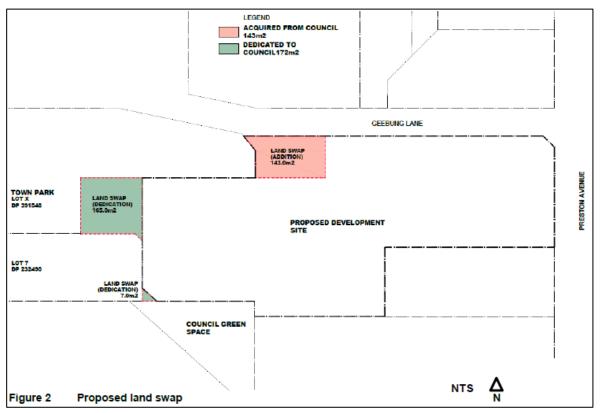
Site Plan of boundary adjustment and land swap approved as part of DA19/0638.
